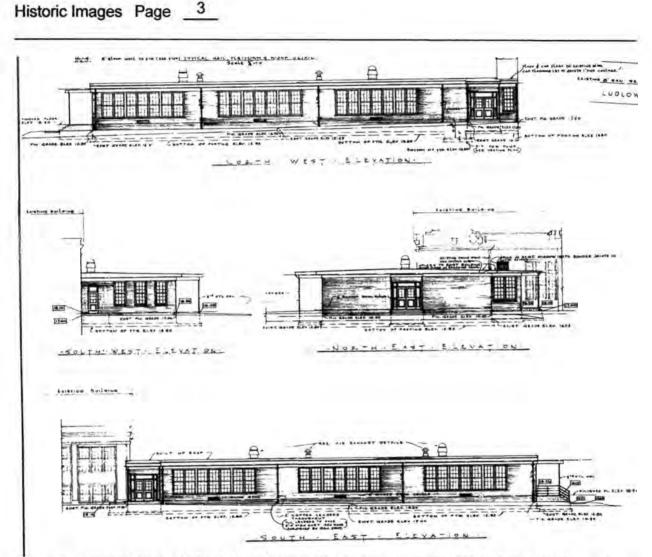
Gregory Primary School, Long Branch, NJ. Elevation drawings, 1954 addition. Courtesy of the Long Branch Board of Education.
